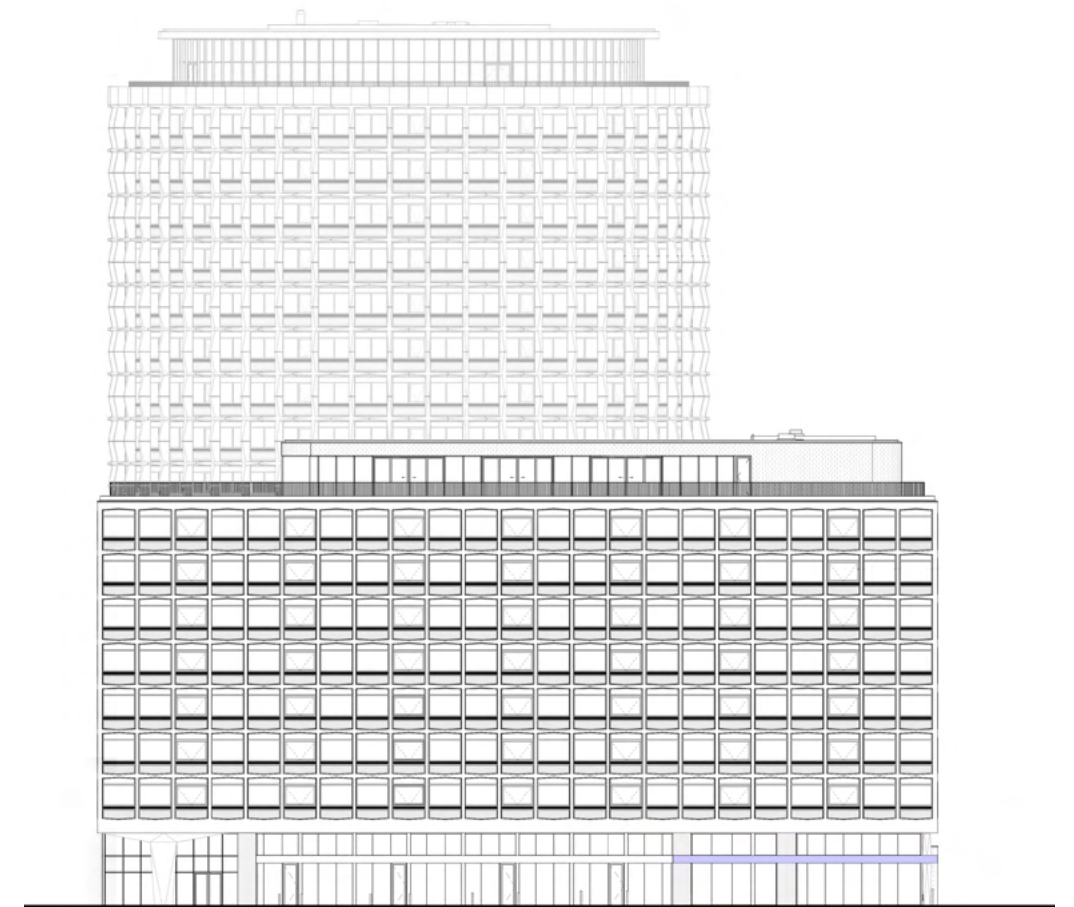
Kingsway West Elevation - MAT 08 location
